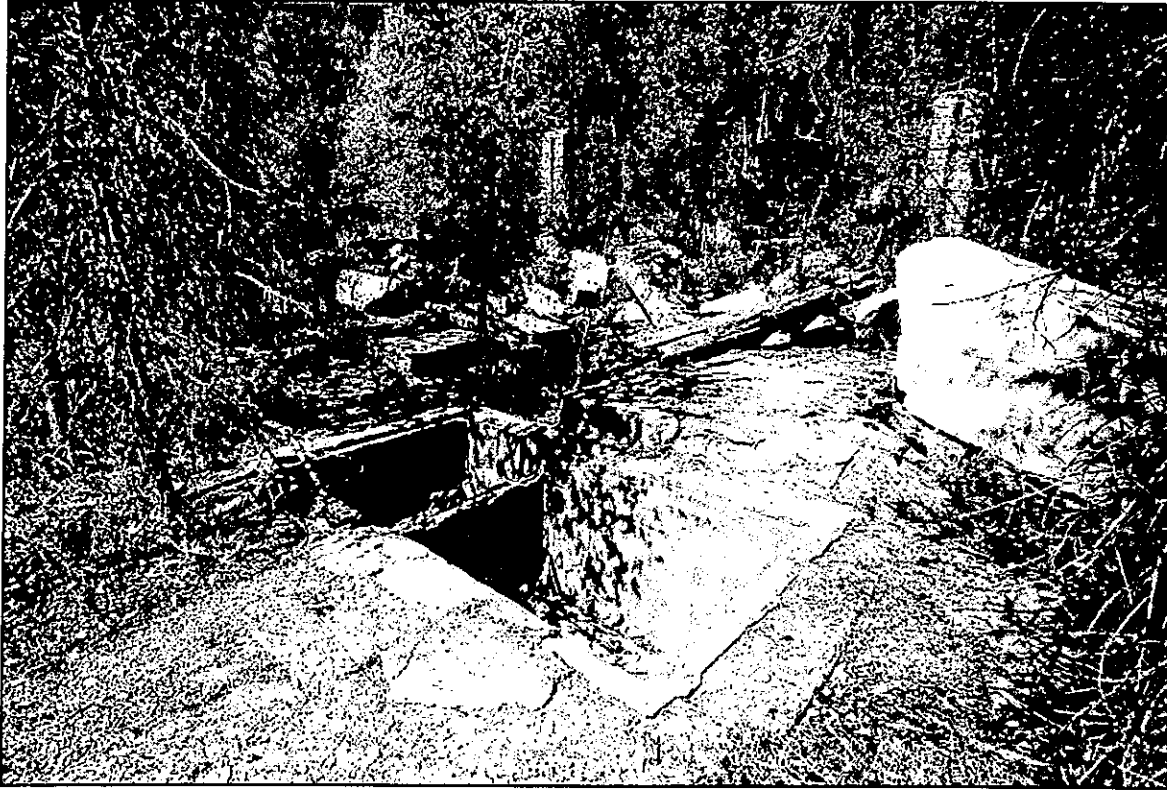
Large open drainage sumps and collapsed concrete flooring characterize Section C of Mill B, which make this area hazardous for visitors. Photo looking northeast.
